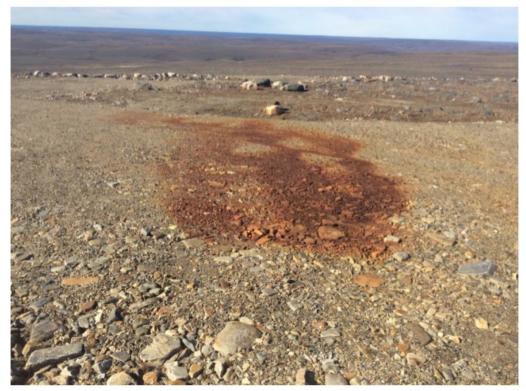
FOX-3 – Station West Landfill – Lobe A, north crest edge – Feature B – Red staining [Acceptable], facing northwest (ATT13\_Photo13.jpg)
